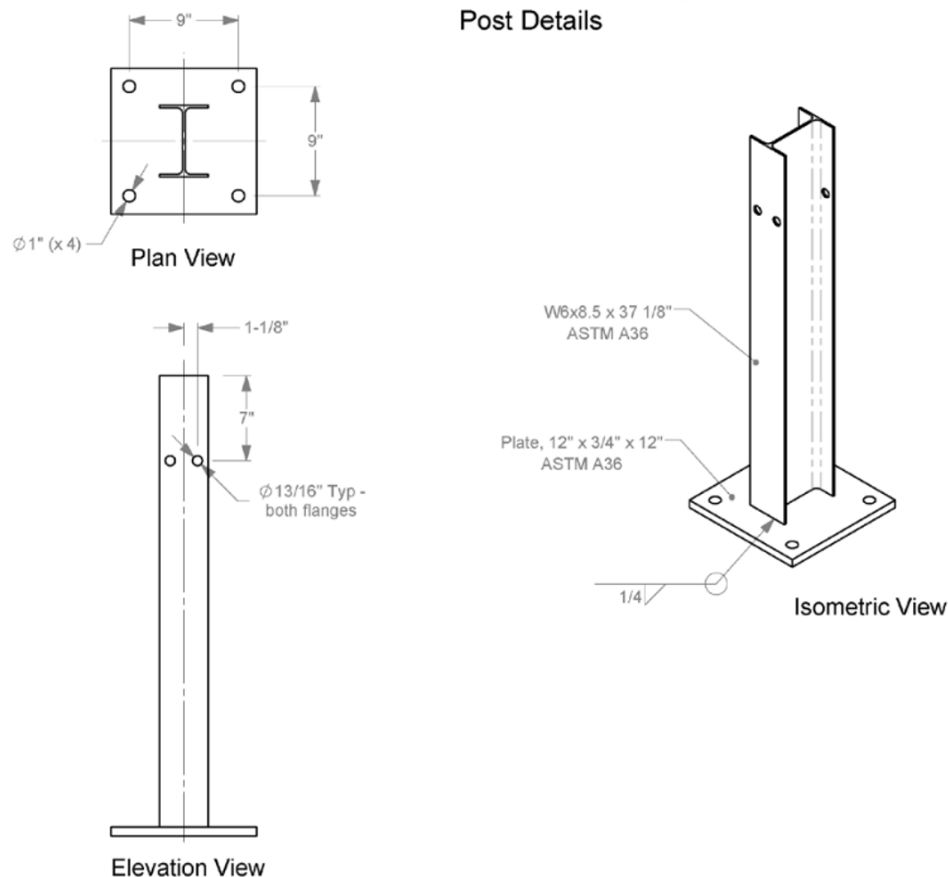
Post and Baseplate Details of the TTI Guardrail System (2).
